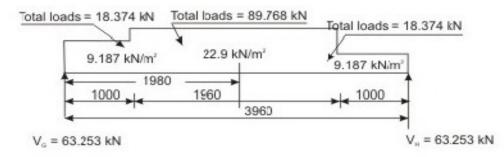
Calculation of loads, sec 2-2 of Fig. 9.20.21, Example Q.8
